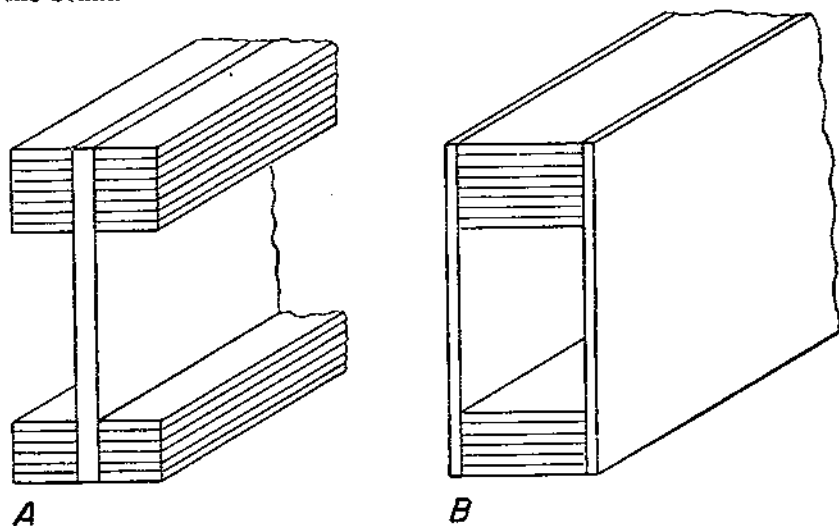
Laminated construction combined with plywood: A, I section; B, box section.
